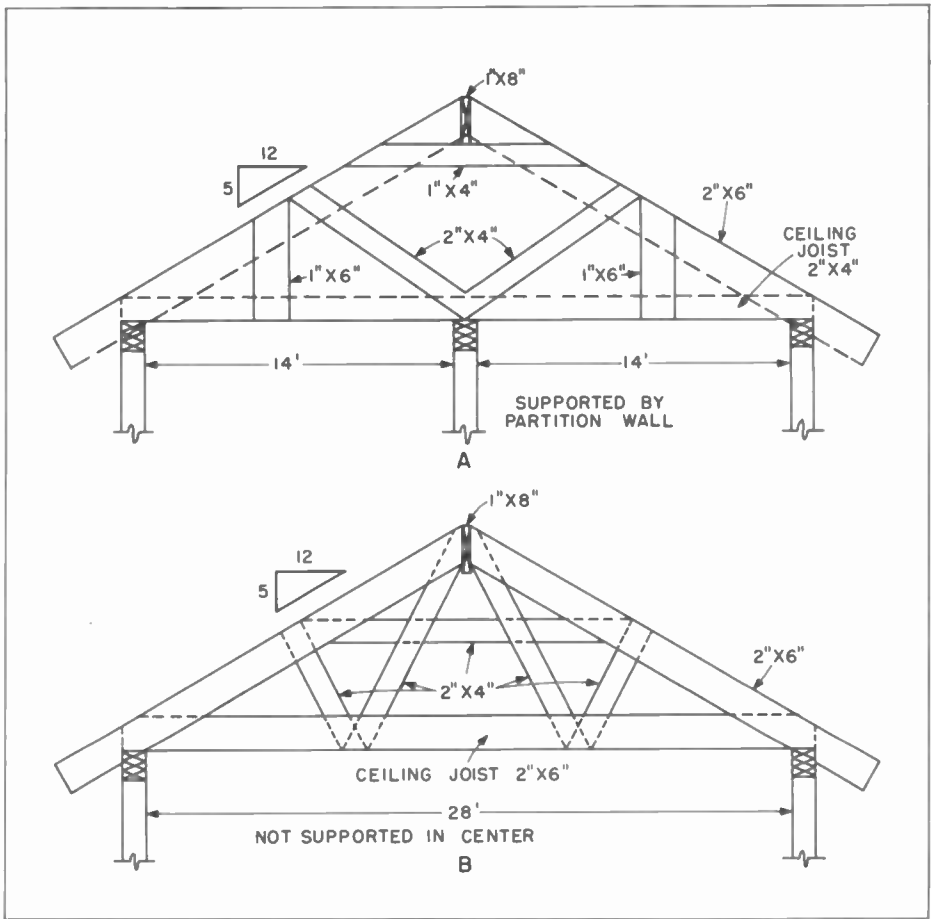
Typical Roof Trusses (A—Supported, B—Non-Supported)
